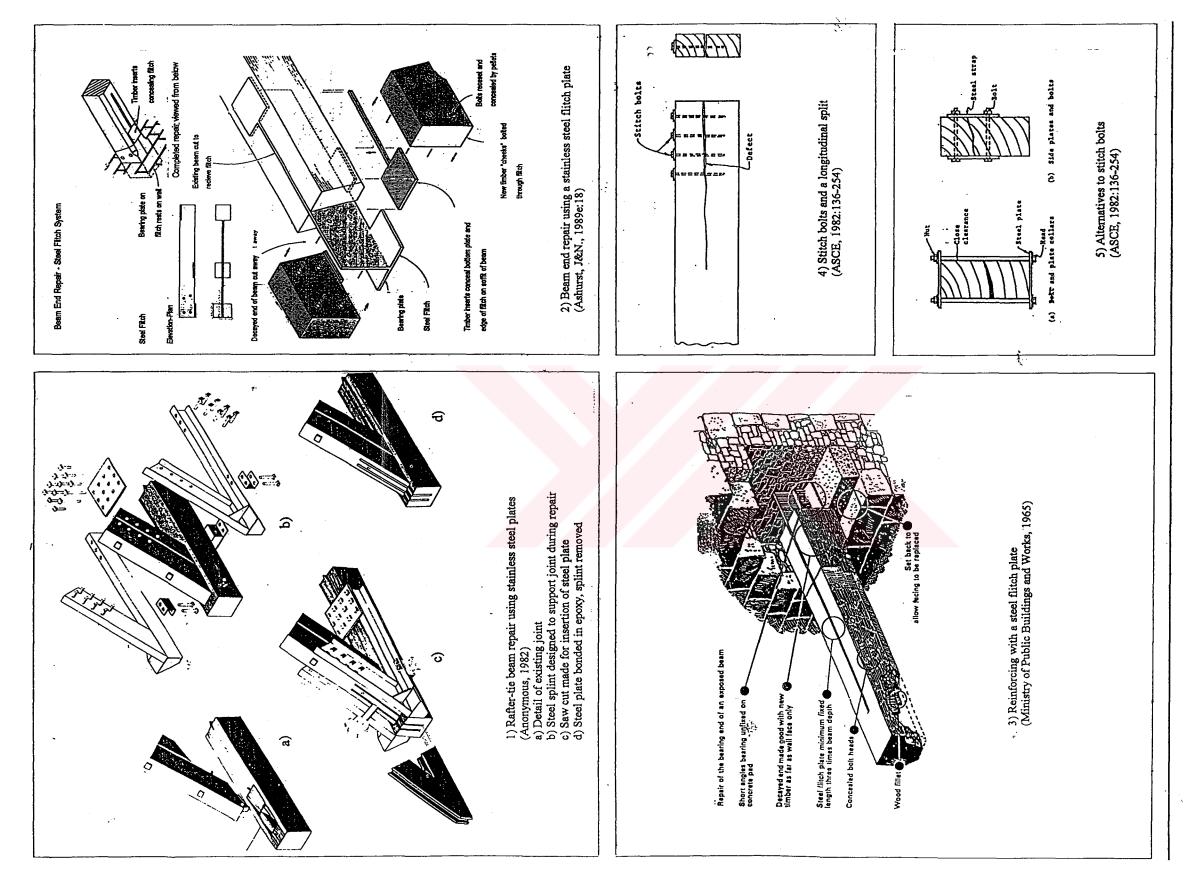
Repair of a Decayed Timber Members with Stainless Steel Elements
